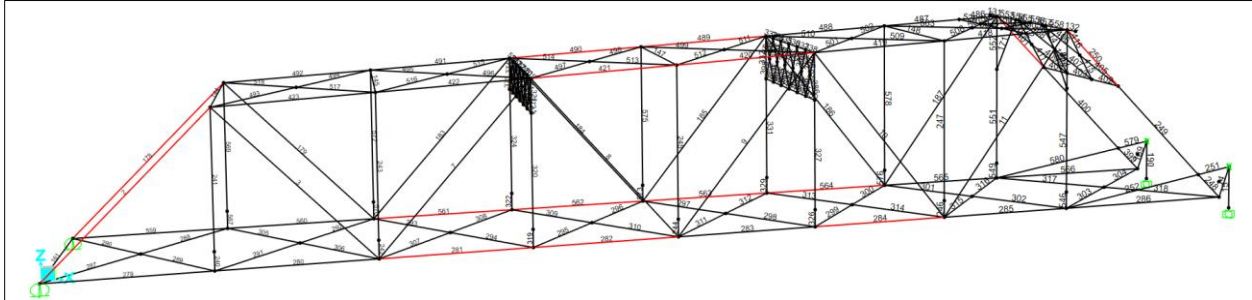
Option 1 – Through Truss – Elements with D/C >1 shown in red.
